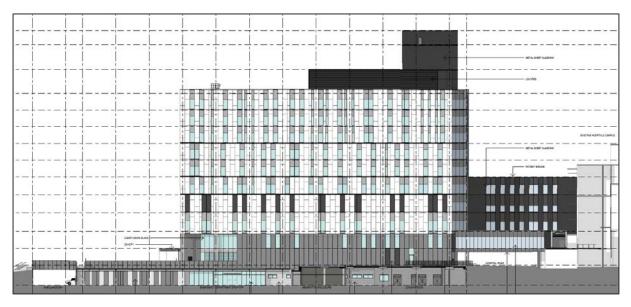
| South Elevation (Source: Applicant's Additional Information)
